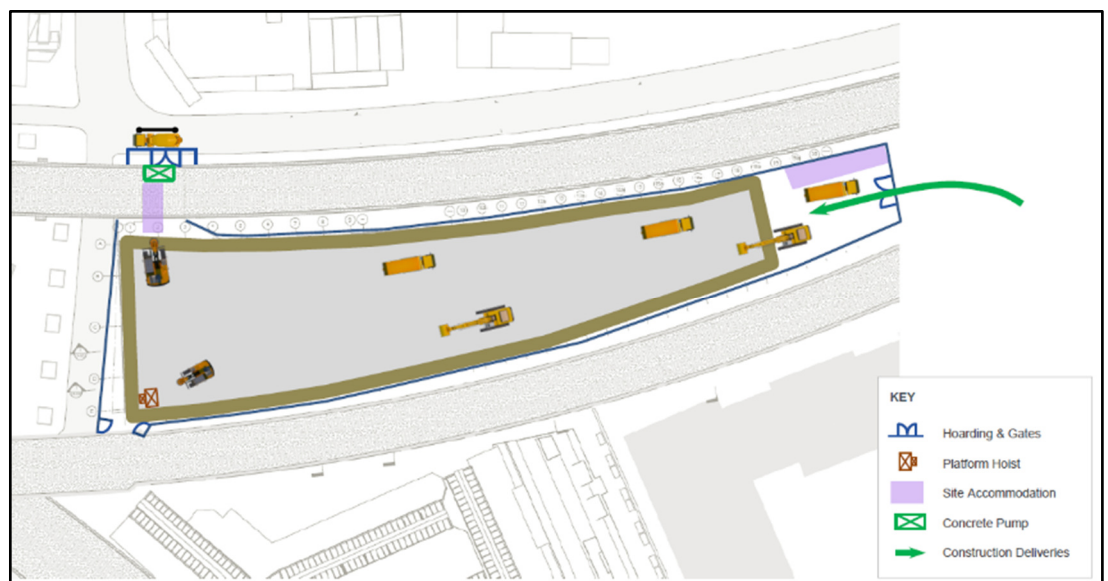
Substructure Phase Construction Arrangement (Blue Sky Building Plan)
